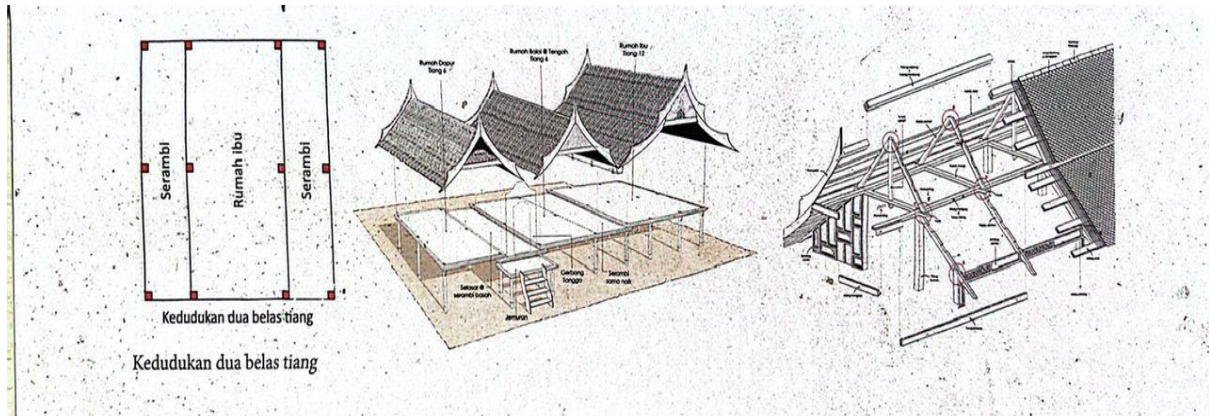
The Layout Plan of Rumah Kelantan Tiang 12
